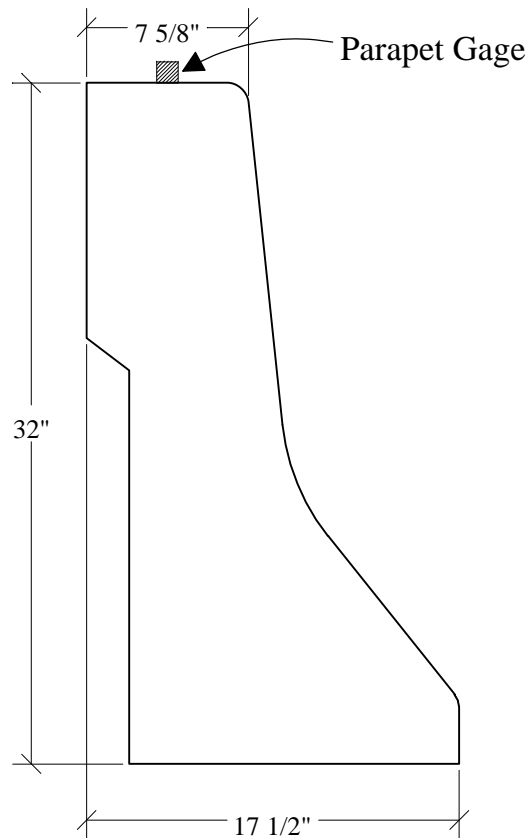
Cross Section of Type T502 Parapet with Strain Gage Location
